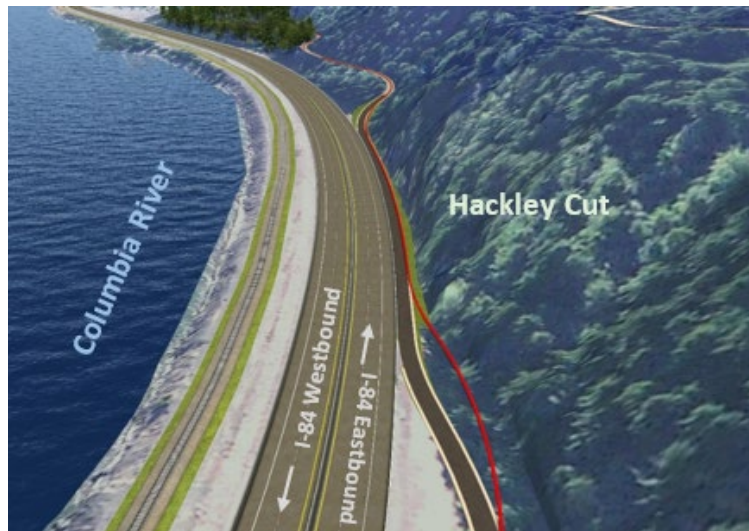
Trail Refinement at Hackley Cut (STA 400+00) with alternative alignment consider shown in red.
